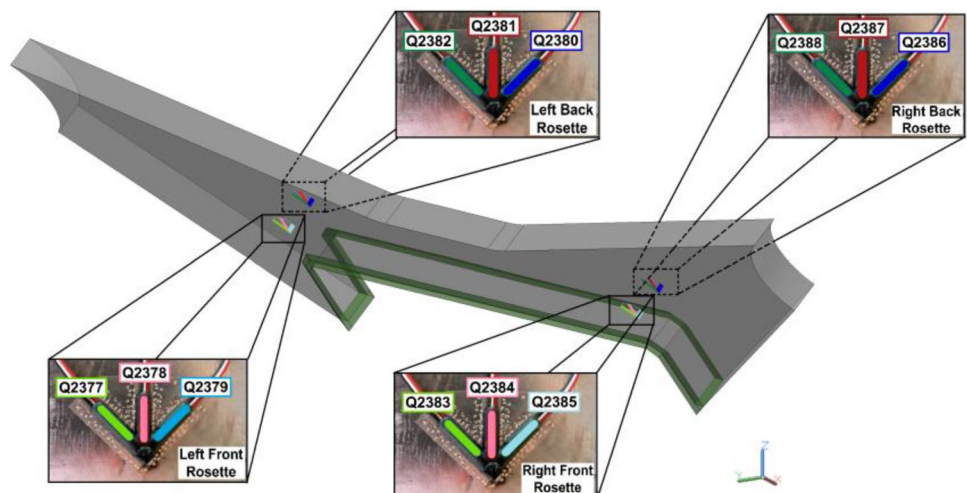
Instrumented bracket location with close-up view of bracket and instrumentation
